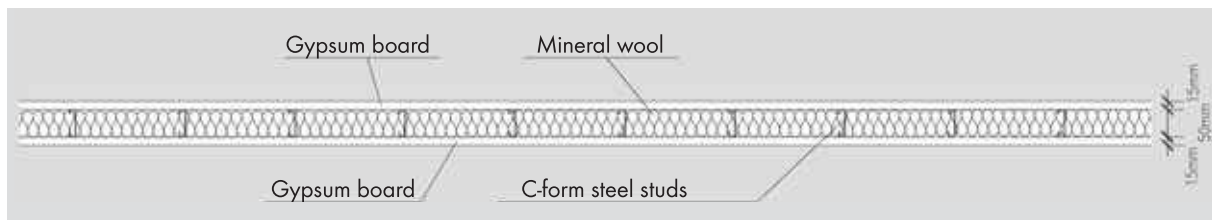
Horizontal cross-section of a lightweight reference gypsum board partition wall
